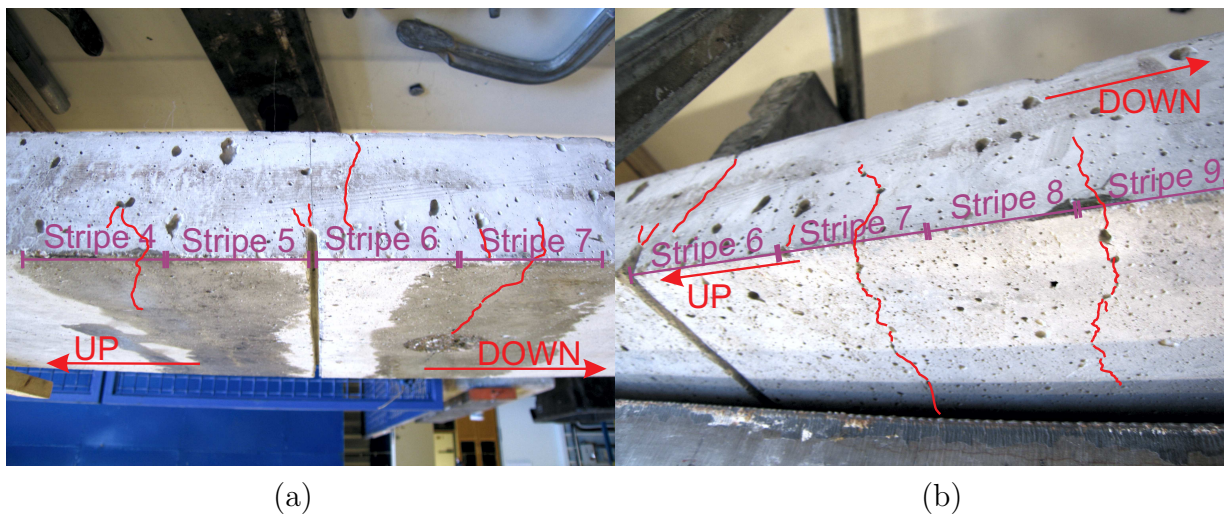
Visible cracks on the plate after applying larger linear loads with C-clamps. The left-most crack in (a) and the right-most crack in (b) seemed to be less deep.
